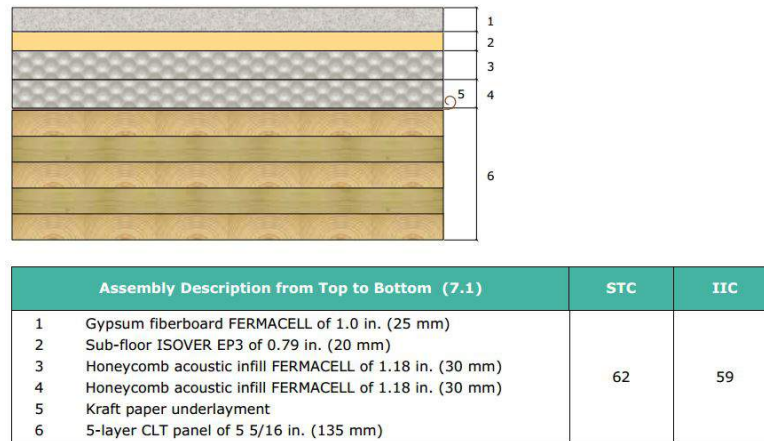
Acoustic Floor Assembly. Source: CLT Handbook.
